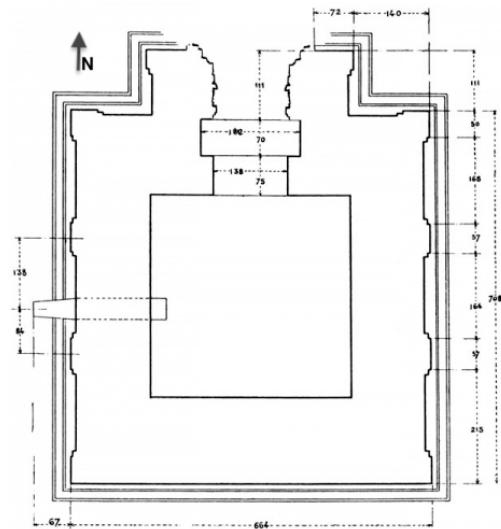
Ground plan of a brick structure on Phnom Sambok (Source: Parmentier 1927: PLXCVII; CISARK)
